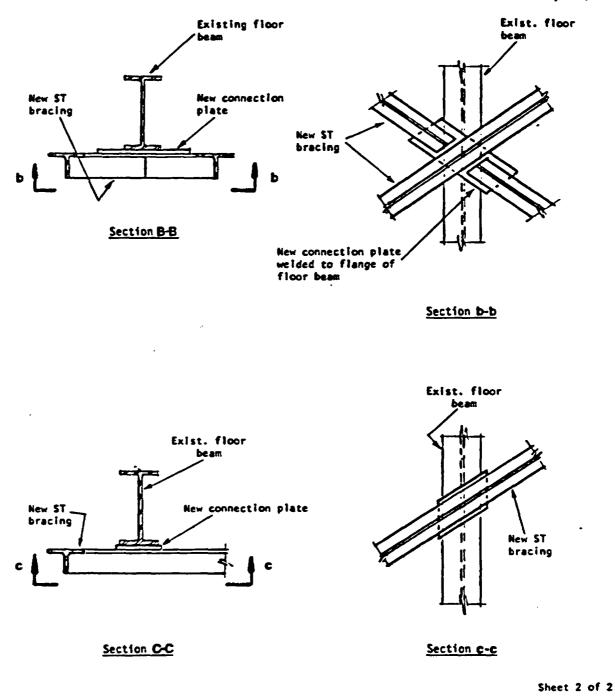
Strengthening of an existing steel frame building with horizontal bracing. (Sheet 2 of 2)
